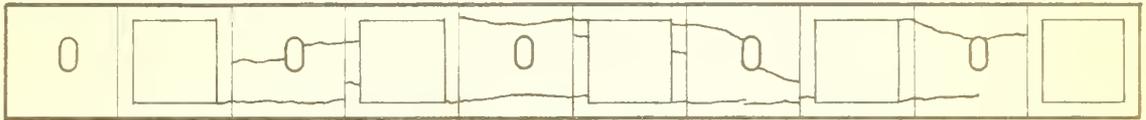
FIGURE II. TYPICAL CRACK PATTERNS AT VARIOUS SECTIONS OF SLAB.
